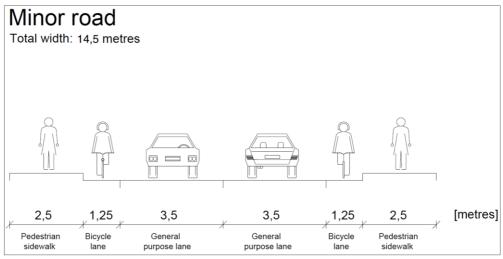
Cross section of the minor road. [Figure made in AutoCAD]
